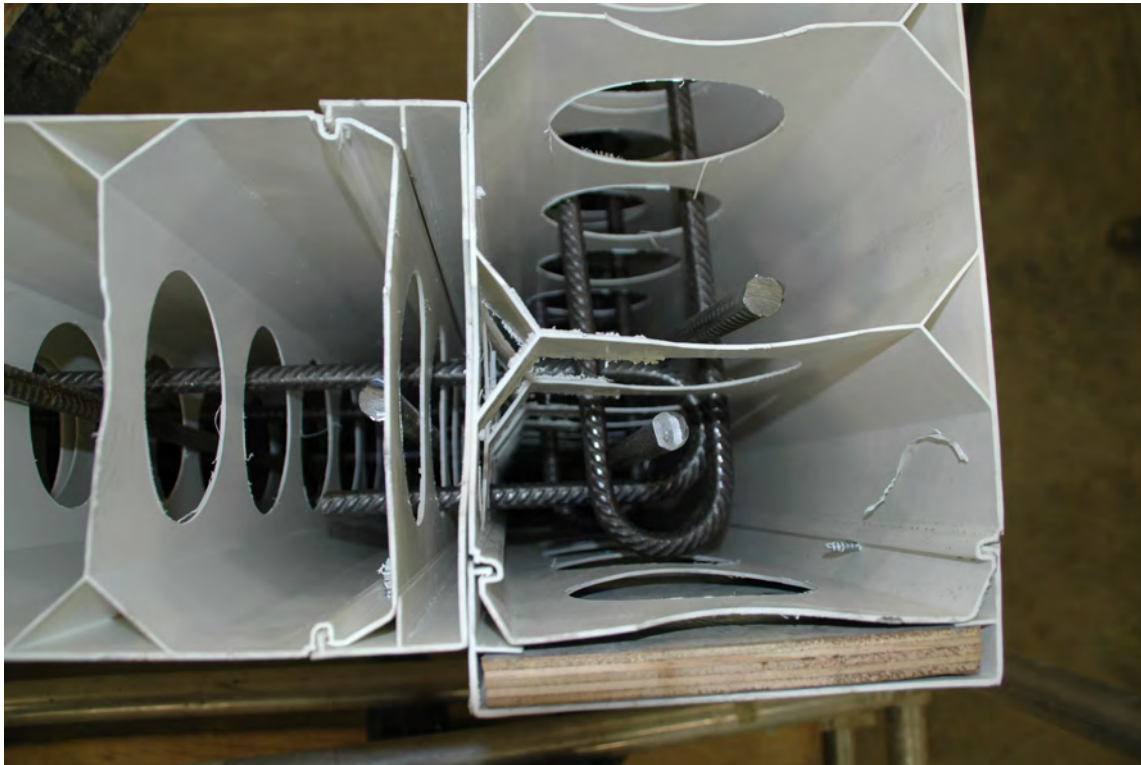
Polymer forms and steel reinforcement – Wall corner
